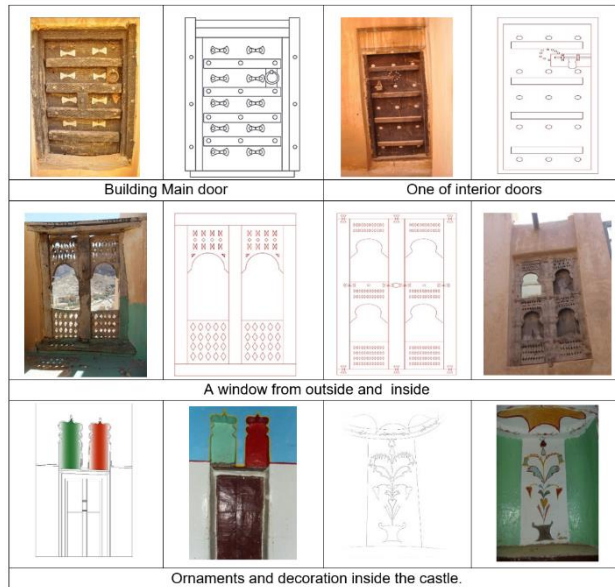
Samples of ornaments and building component details "Photo & student's drawings".
